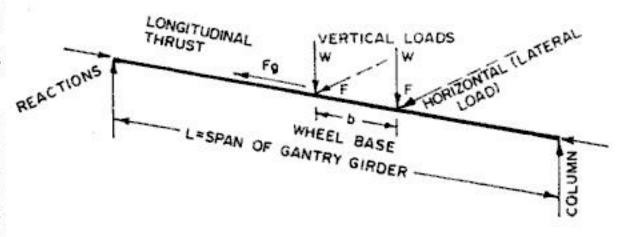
FORCES ACTING ON GANTRY GIRDER
